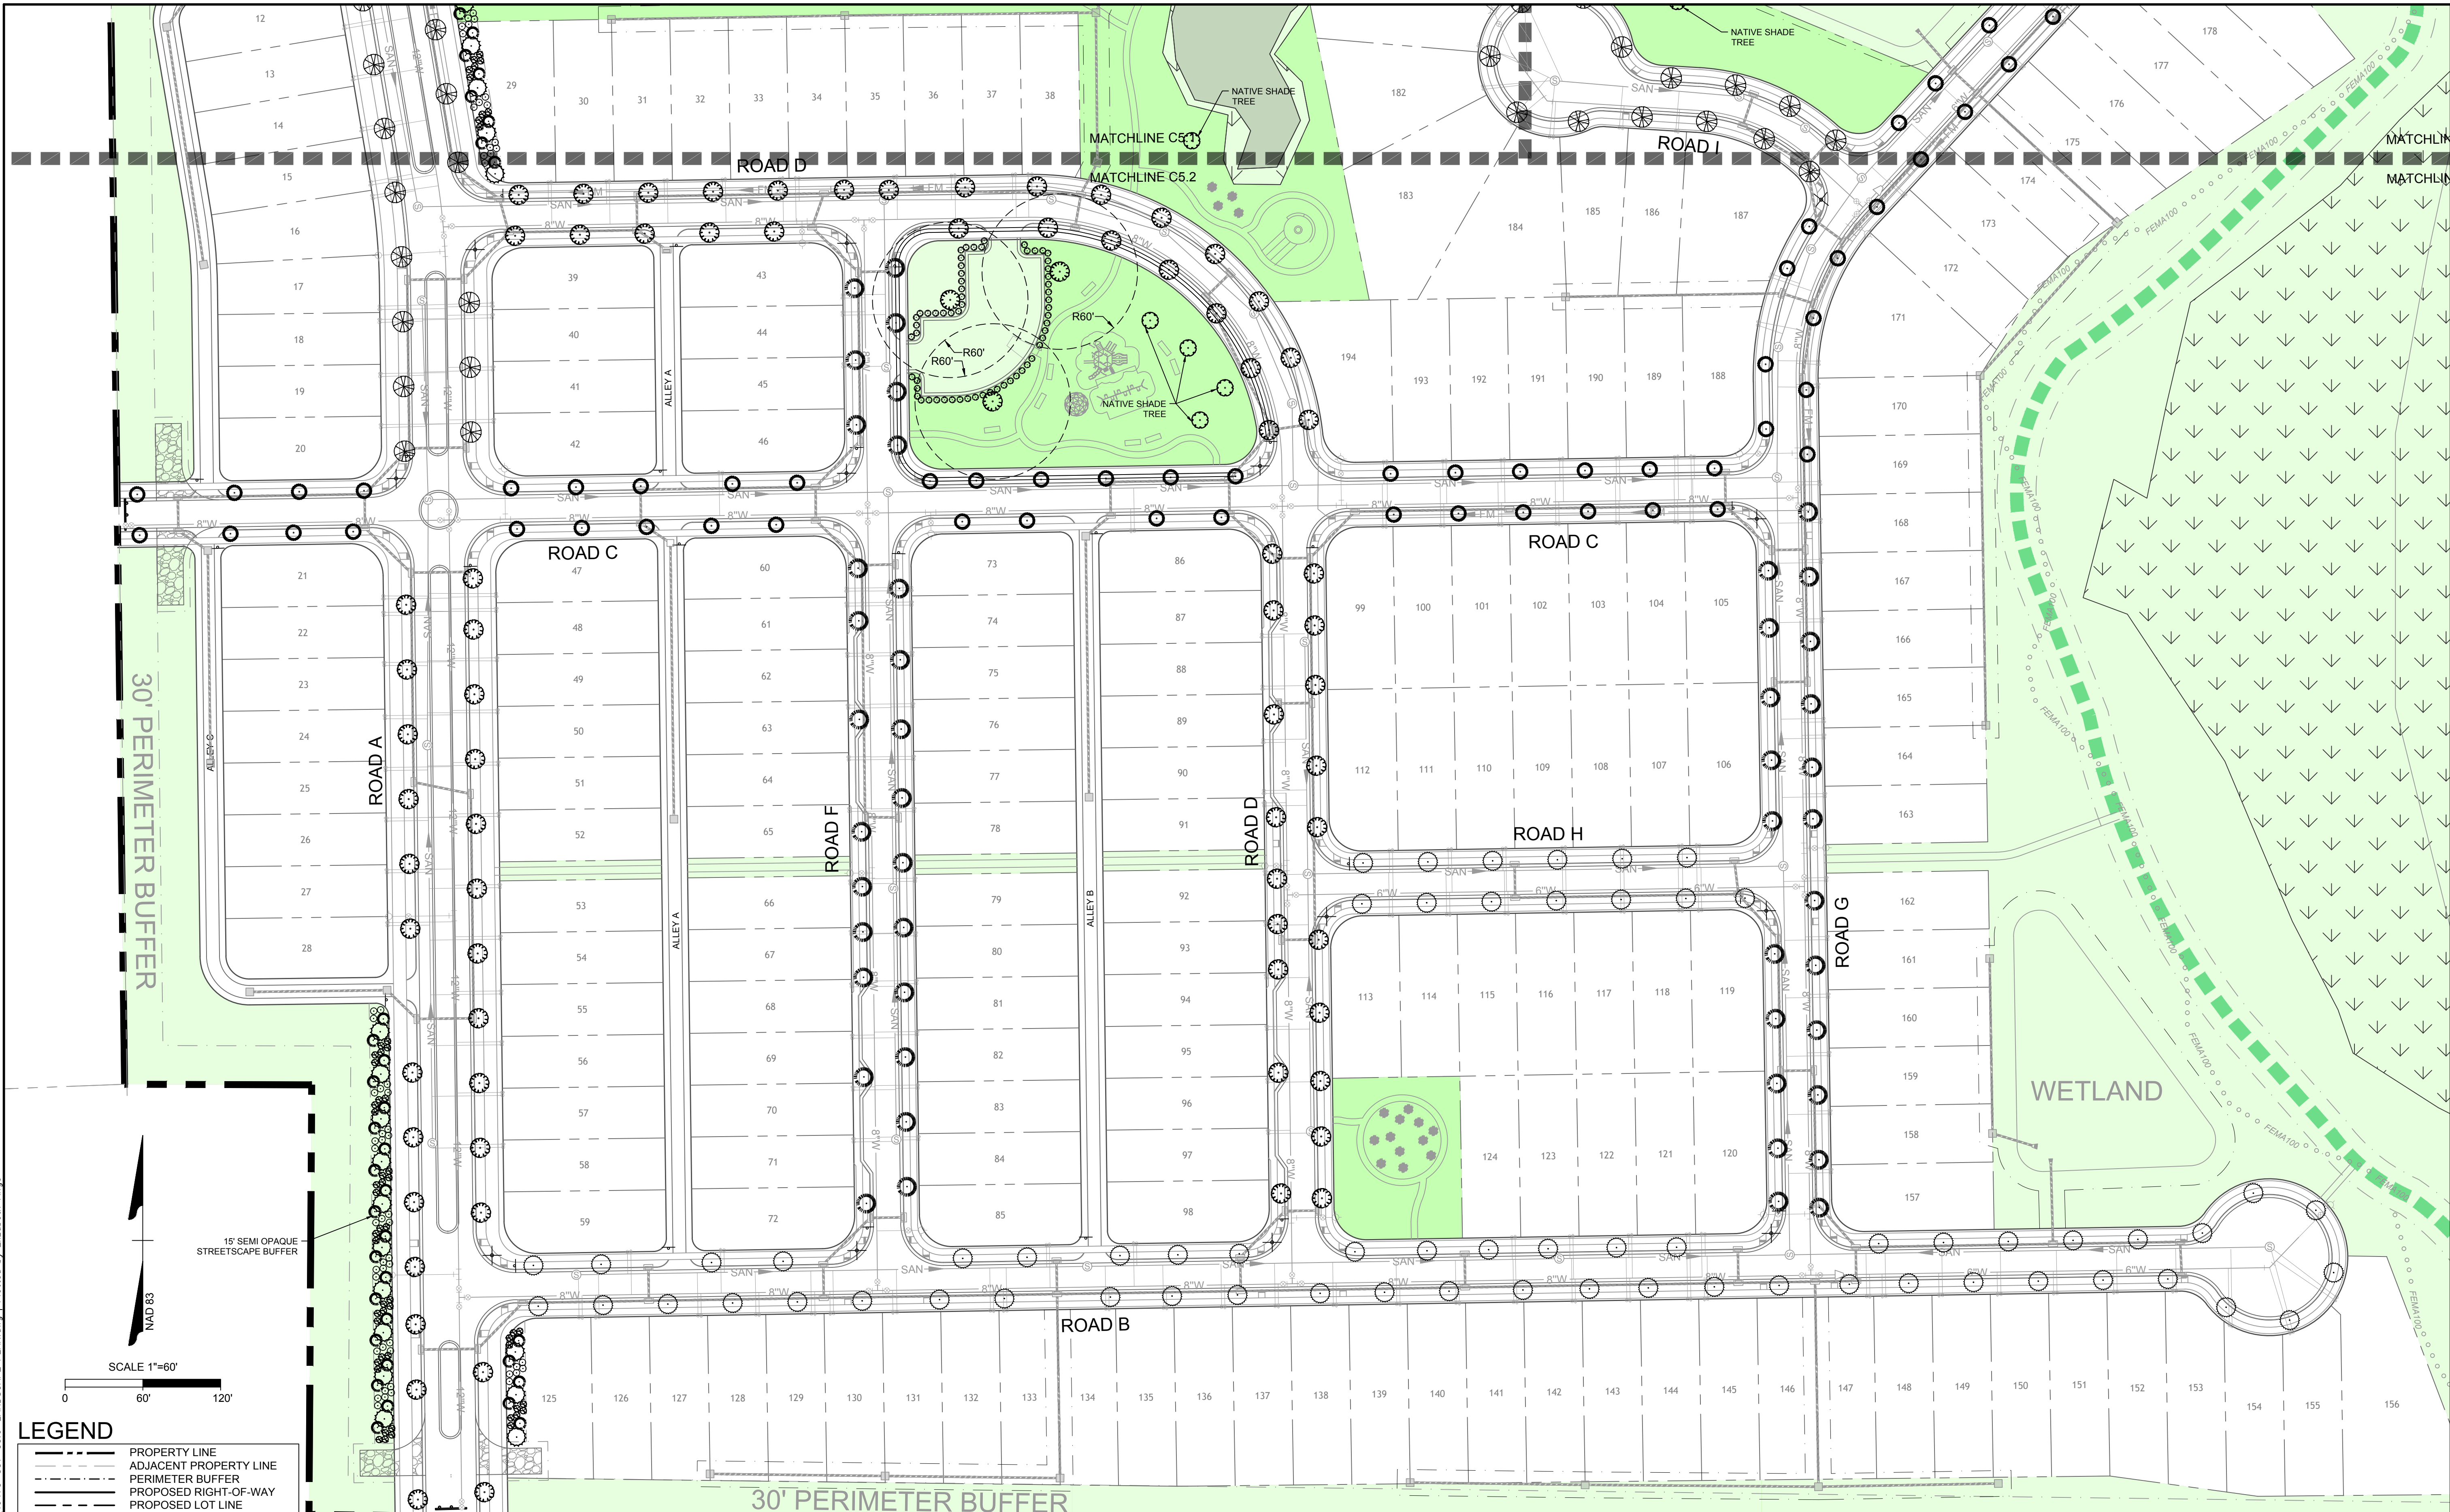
DETAILED LANDSCAPING PLAN SHEET 1 OF 3
